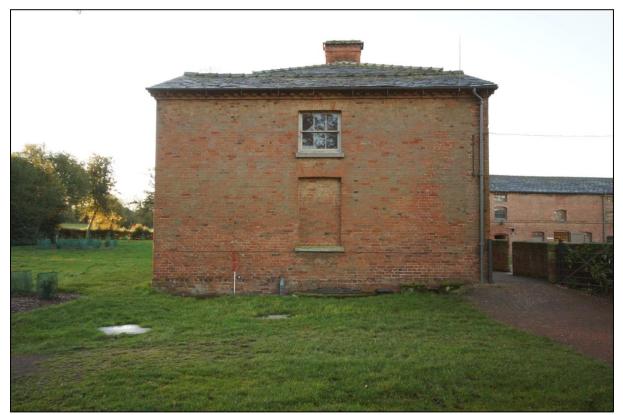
North-east elevation of Building 01, viewed looking south-west. Scale = 1m.
